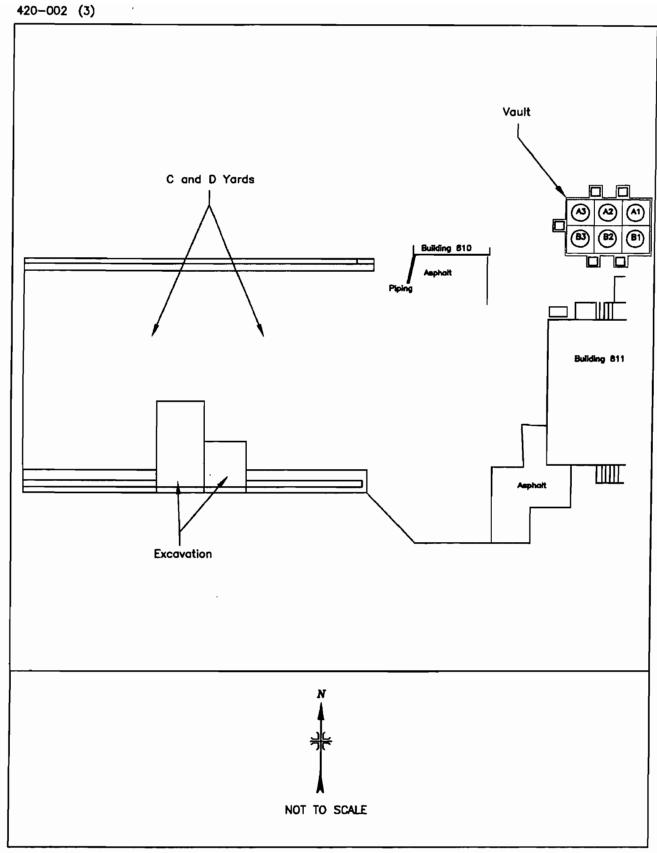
Plot Plan - Waste Concentration Facility 811 C and D Yards and Vault
